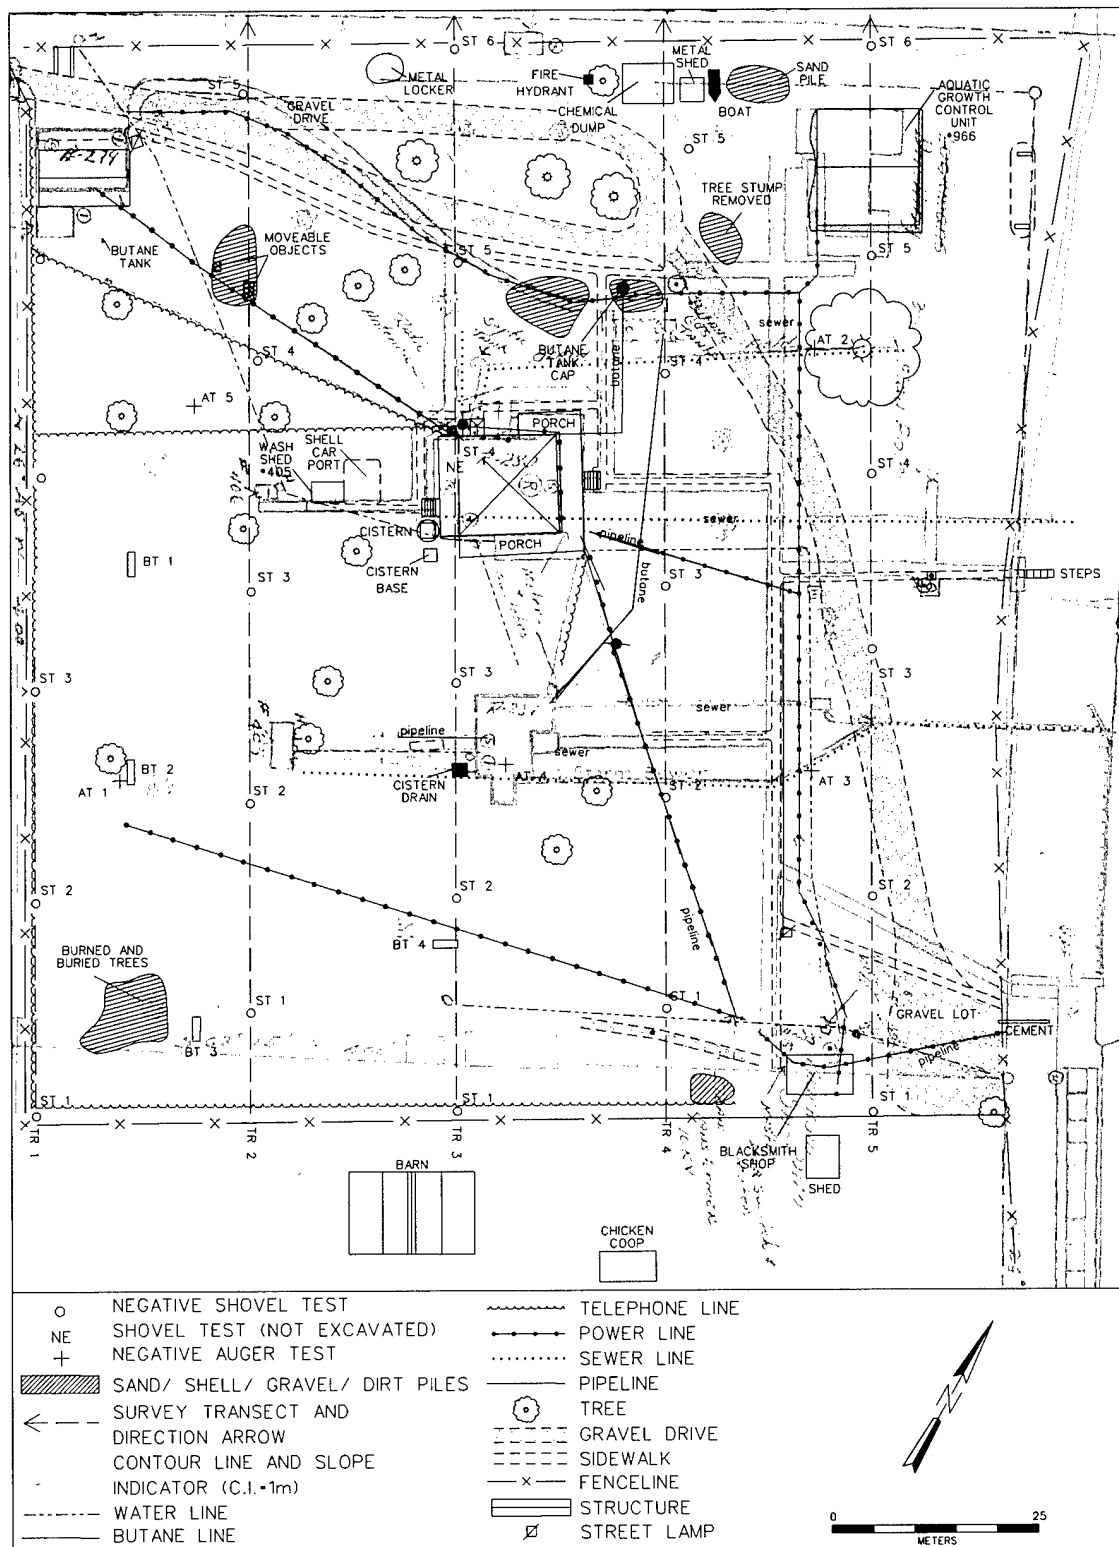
Overlay of engineering drawing from 1938 and site plan from current project. Note the expansion of buildings, including a barn, chicken coop, sheds and additional lockkeeper' house. (U.S. Army Corps of Engineers 1938).
